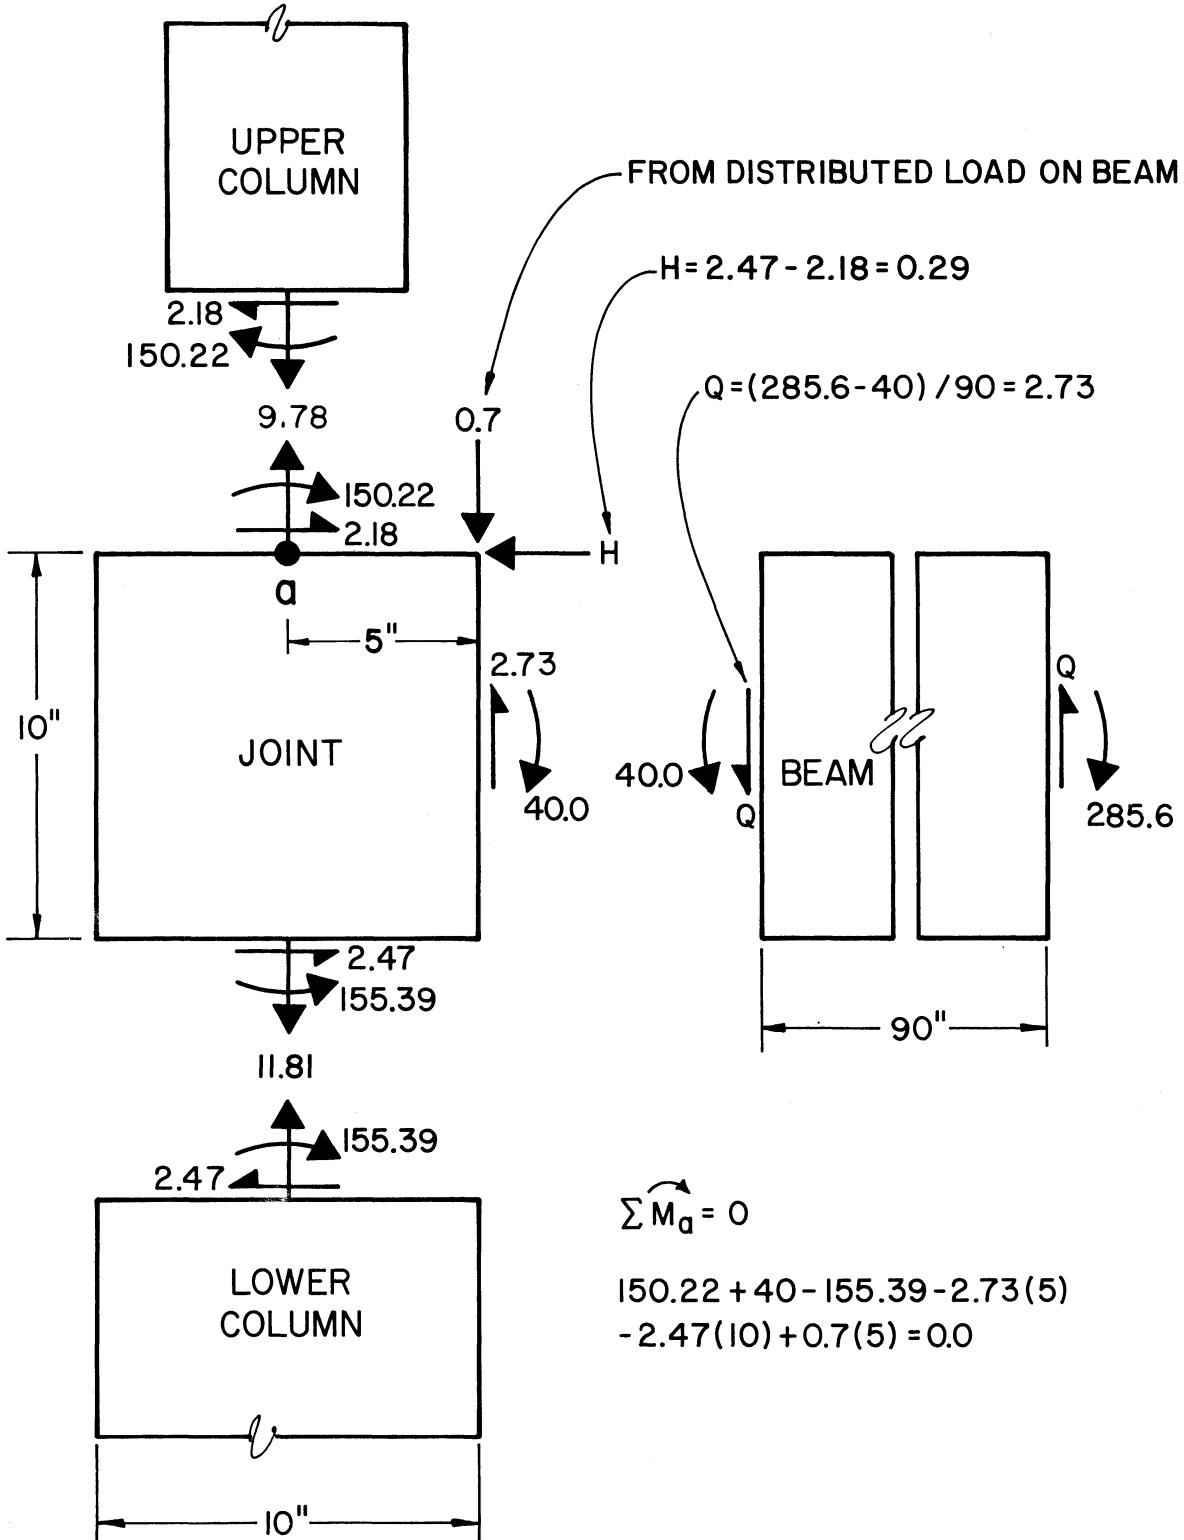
EQUILIBRIUM CHECK OF TYPICAL JOINT
